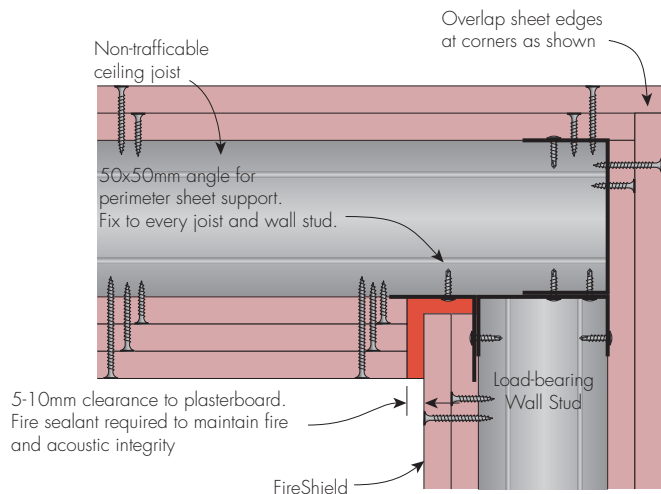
Non-Trafficable Ceiling to Plasterboard Wall
